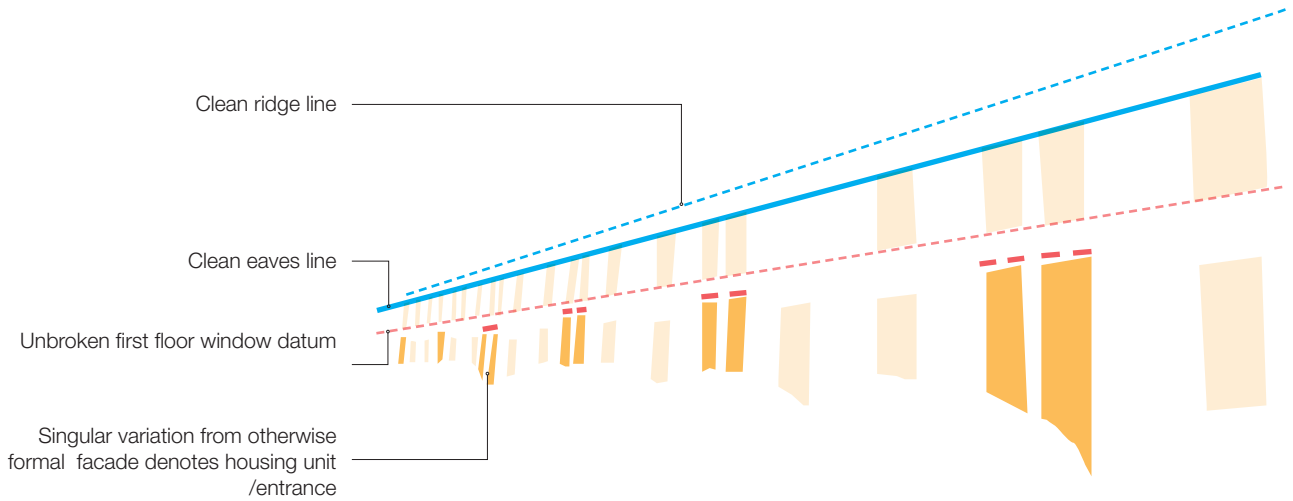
Key elements used to generate typical elevation in development proposal extracted from local precedent above
